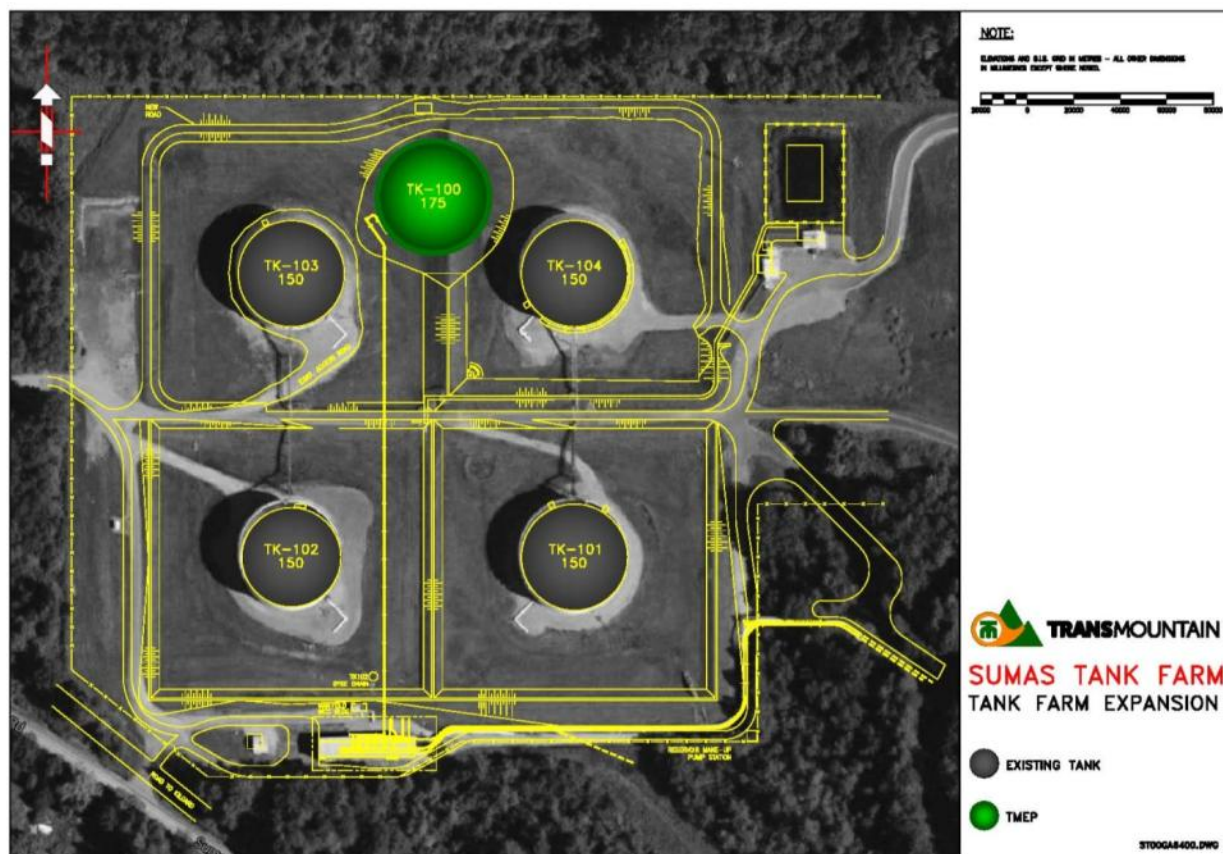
Sumas Terminal Proposed Plot Plan
